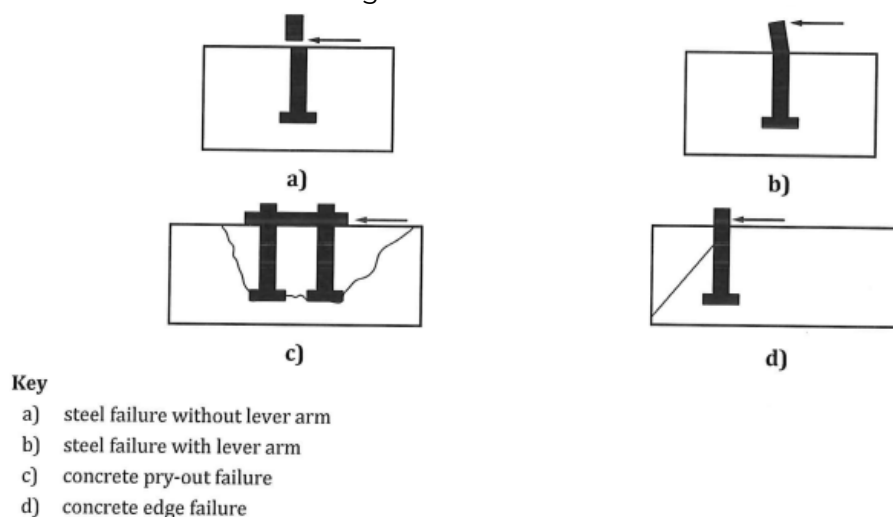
Failure modes of post-installed fasteners in concrete.
